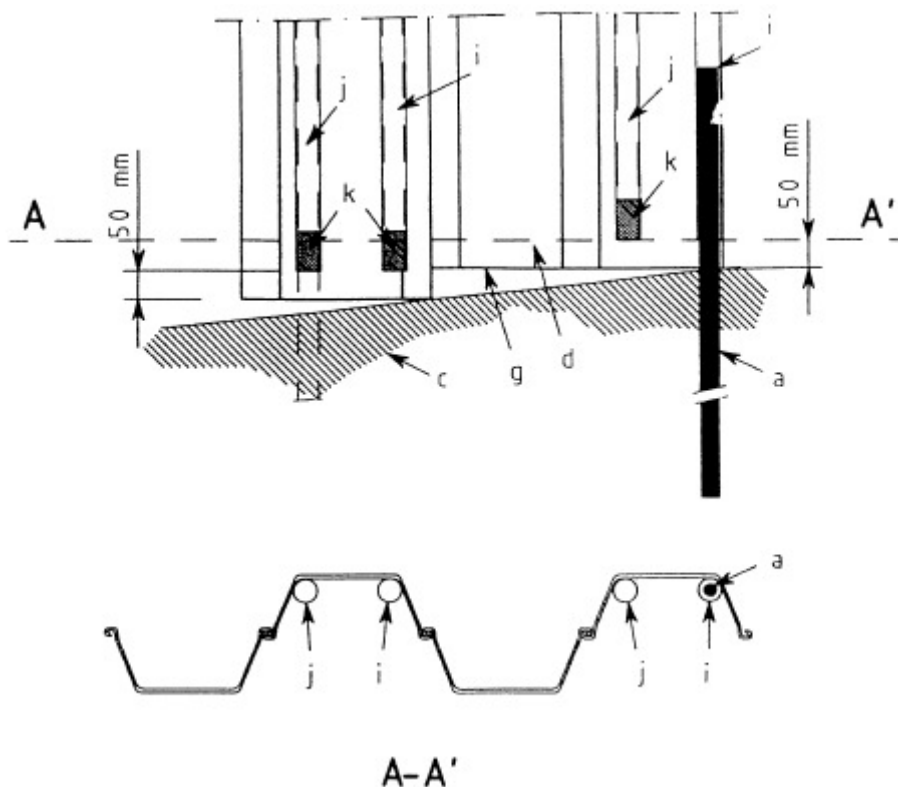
Detail of rock dowels installed through a casing attached to the wall: a = rock dowel, c = bedrock, d = sheet pile, g = level of sheet pile toe, i = casing placed where the distance from the sheet pile to the rock is expected to be the smallest, j = spare casing, k = concrete plug to be put in before installation (SFS EN 12063:1999)
